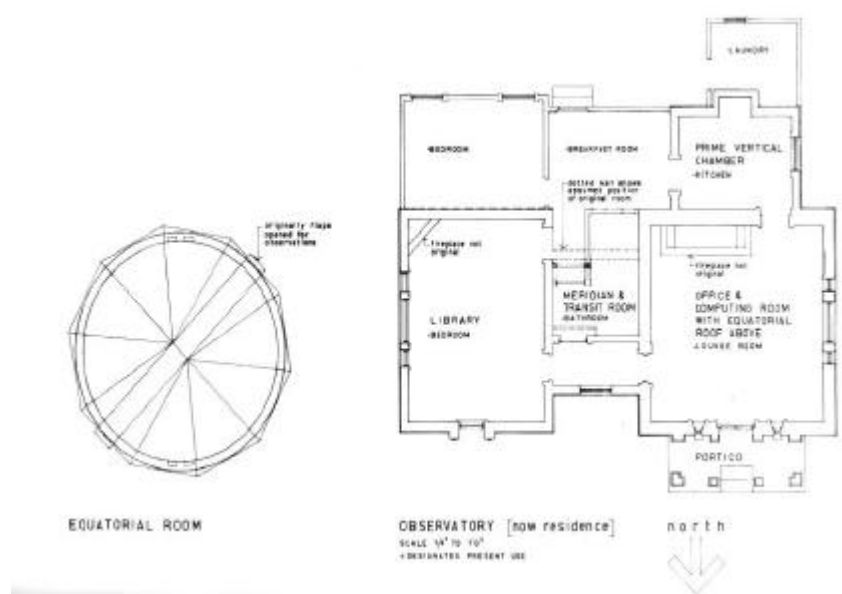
Floor Plan of the standing John Tebbutt Observatories
